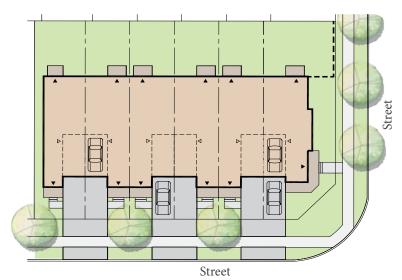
Conceptual Siting of Street Townhouses
